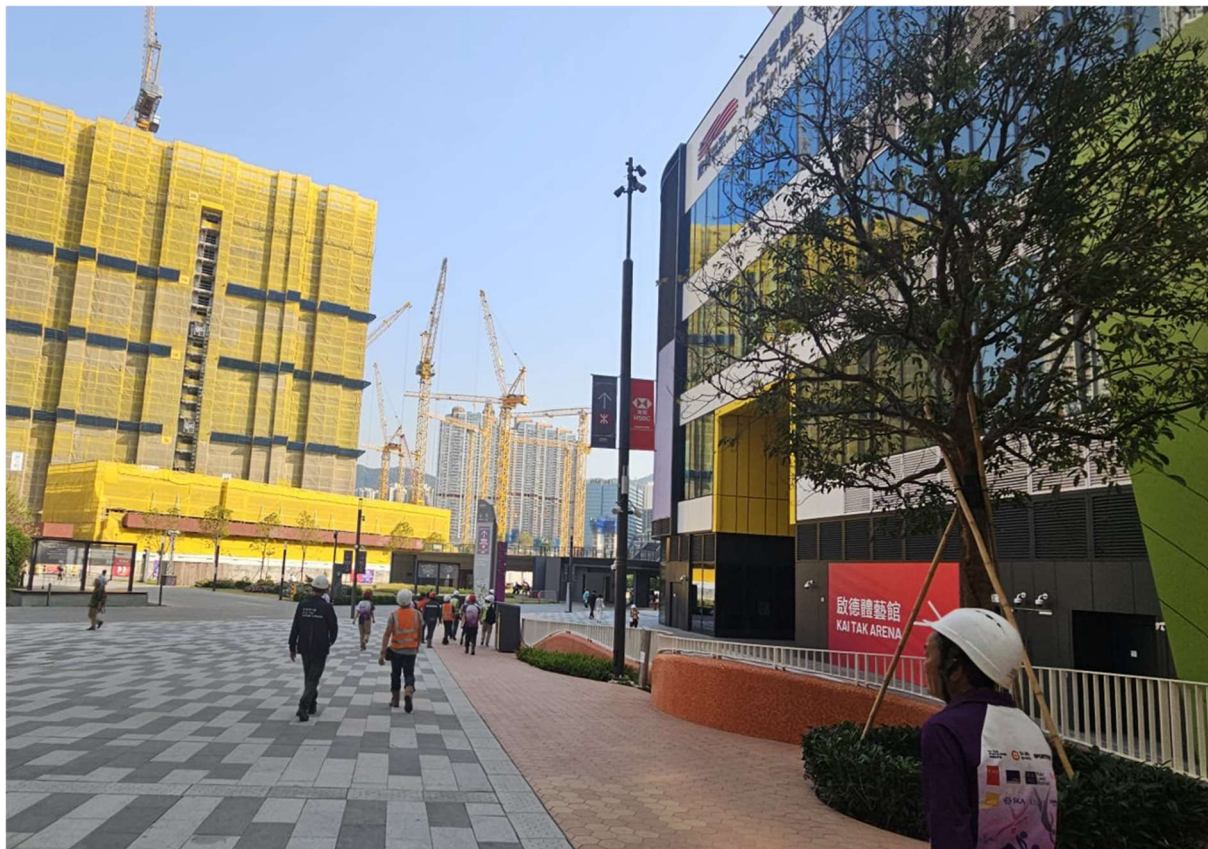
Nearby road traffic along Mok Cheong Street and To Kwa Wan Road at NMS1-T2 on 31 March 2025.
